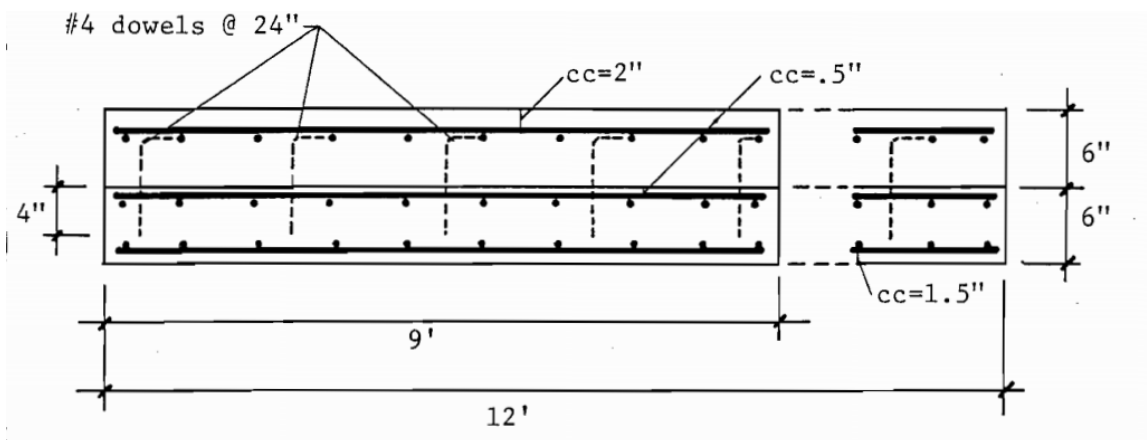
Elevation reinforcement layout for slab panel tests by Seibel and Latham (1988).
